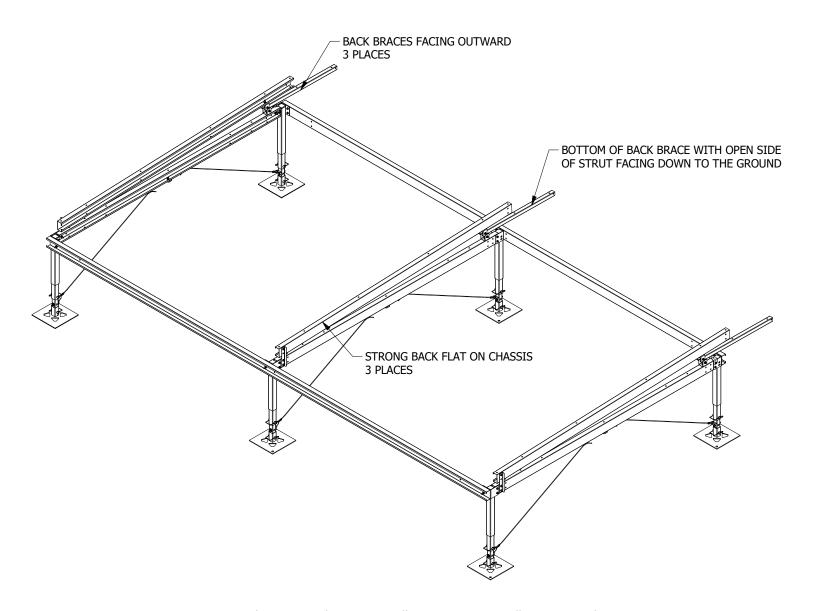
Alternate Back Brace Installation prior to installing Strut Rails.
